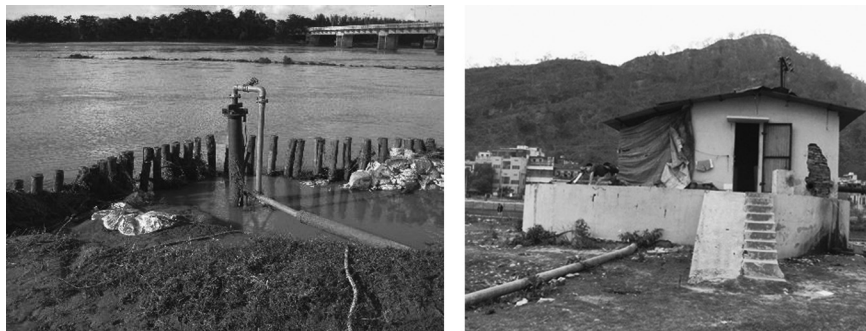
Unprotected wellhead (left) and cracks/fissures in the caisson as well as bathing and washing activities (right) can lead to contamination of the well by direct entry of water from the ground surface.
